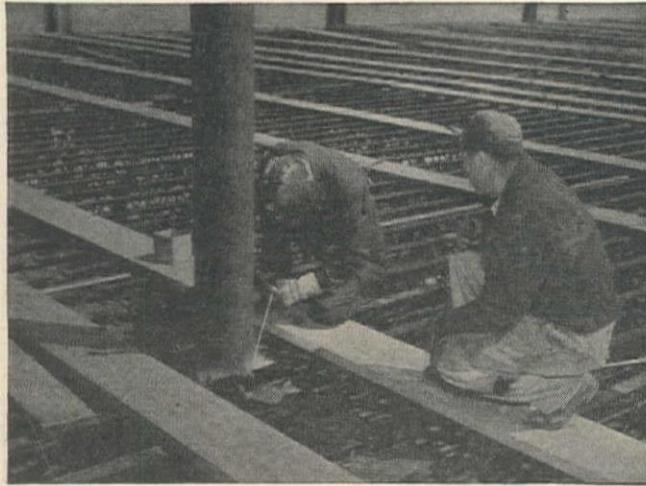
Welding pipe column to first floor I beam. Column has a smaller pipe and concrete inside.
